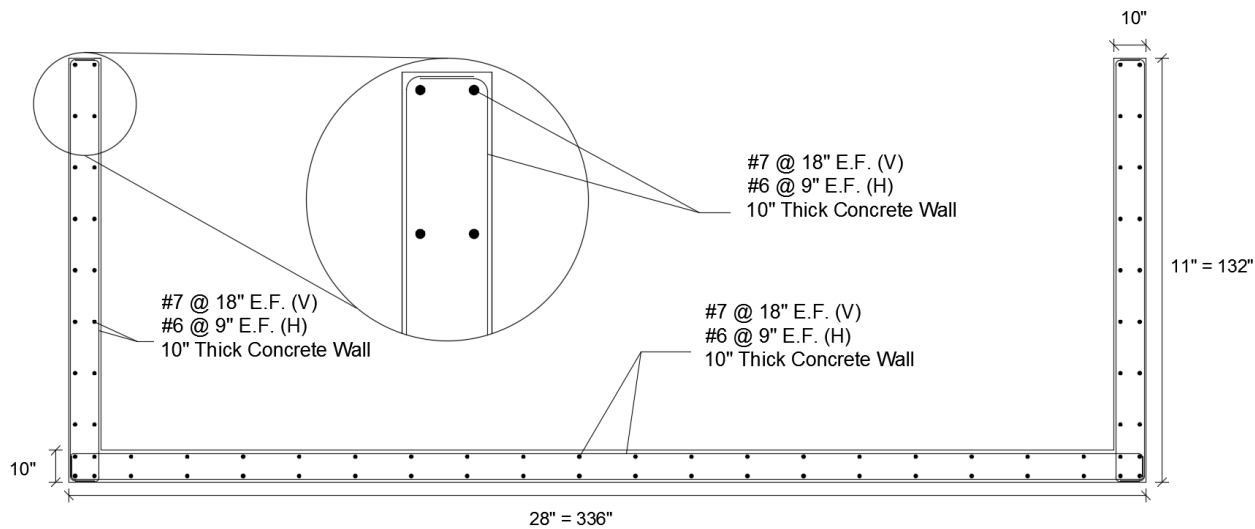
Original Elevator/ Mech. Room shear wall cross-section at the 2nd floor level
